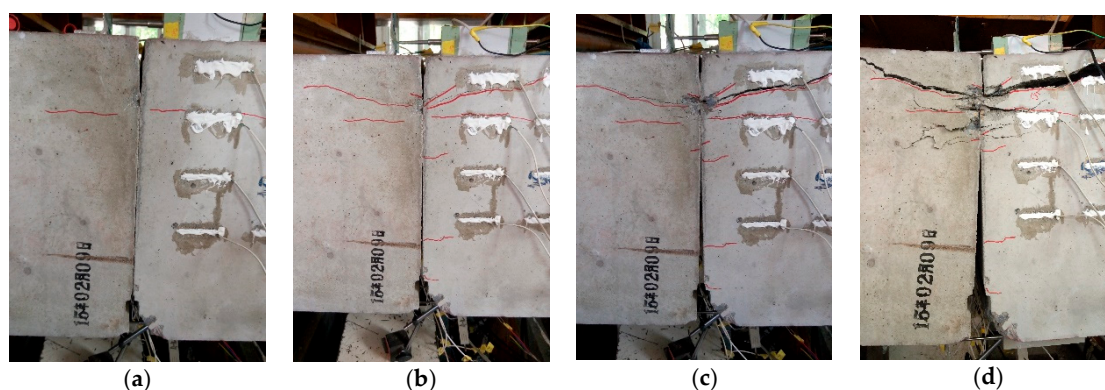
Type-A joint under a negative bending moment: (a) core section cracking; (b) quickly developing cracks; (c) crack penetration; (d) concrete crushing.
